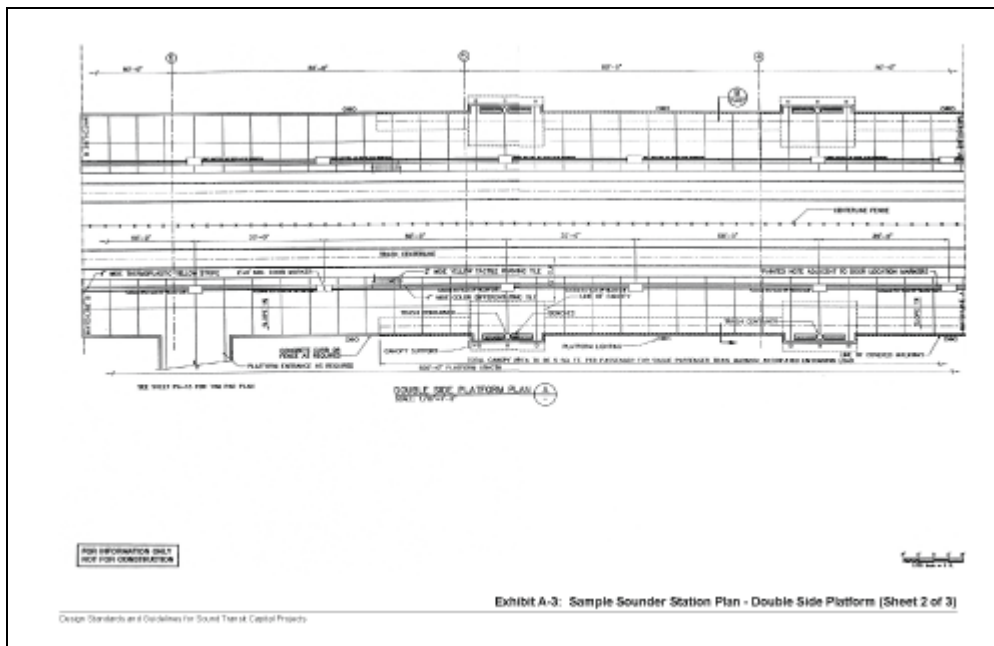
Sample Sounder Station Plan – Double Side Platform (Sheet 2 of 3)
